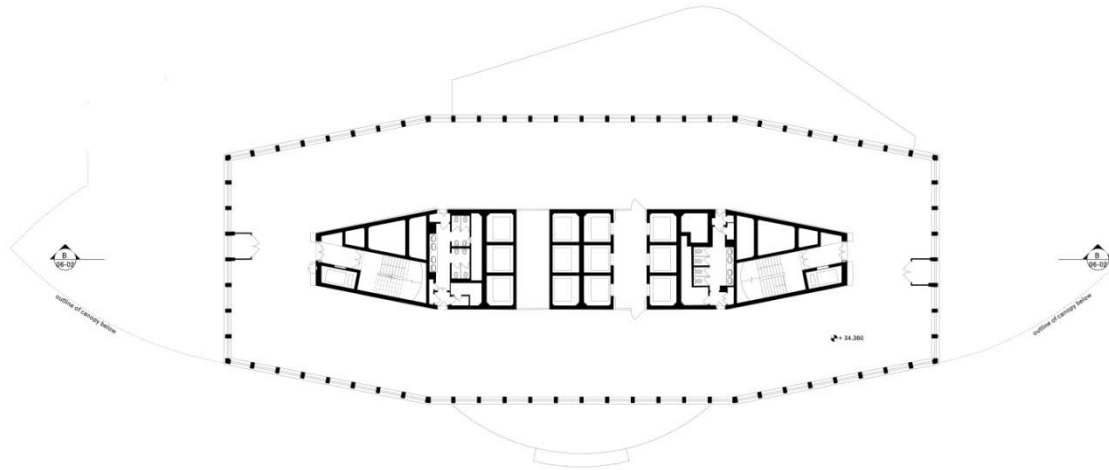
Portland House, Typical Floor Plan 1, Existing (DCA, 2013)
